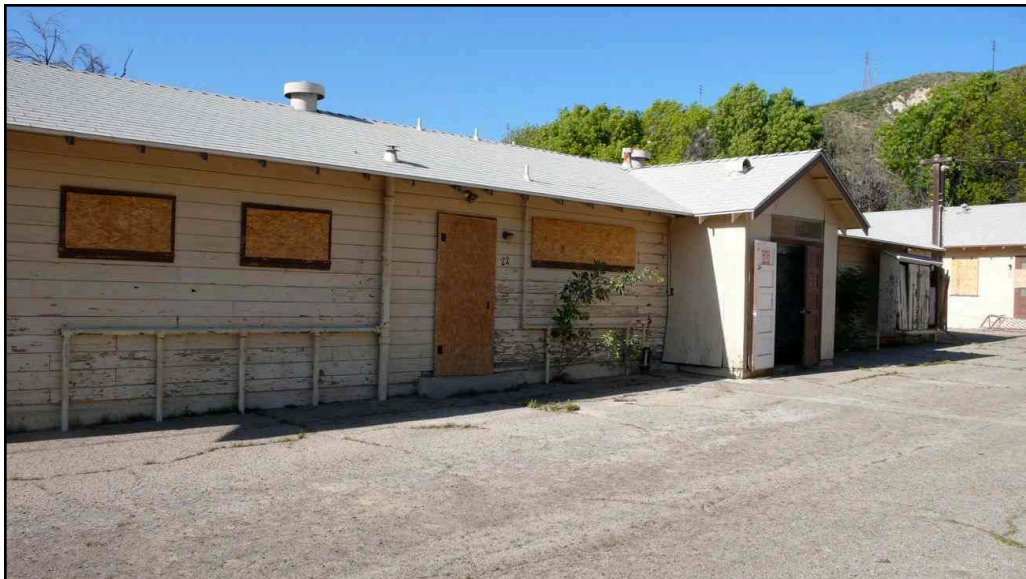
Washroom/laundry building, eastern elevation [16 February 2008]
